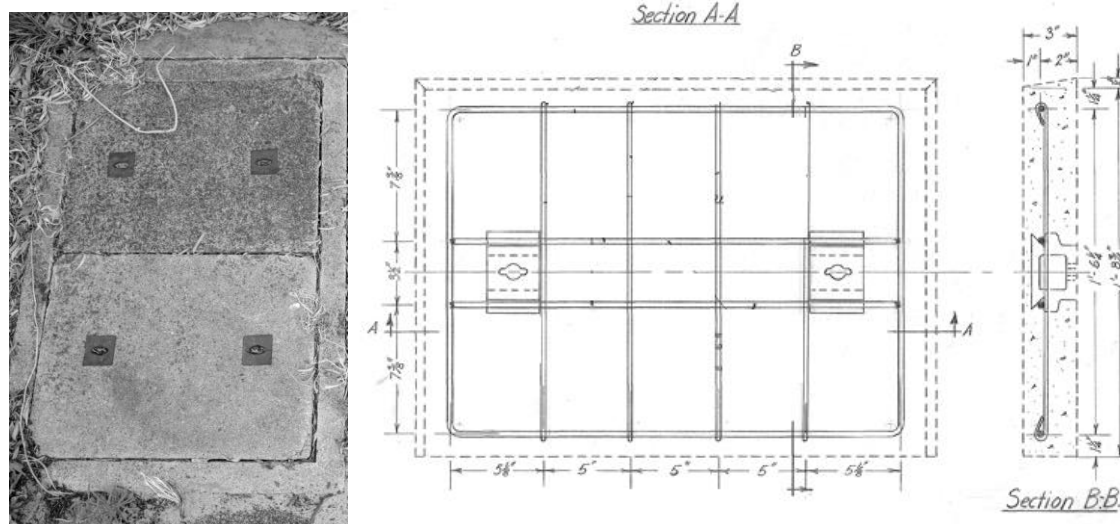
A rectangular two-part reinforce concrete cover shown with an example of a typical reinforcement configuration (M.W.S.S & D.D 1948).
